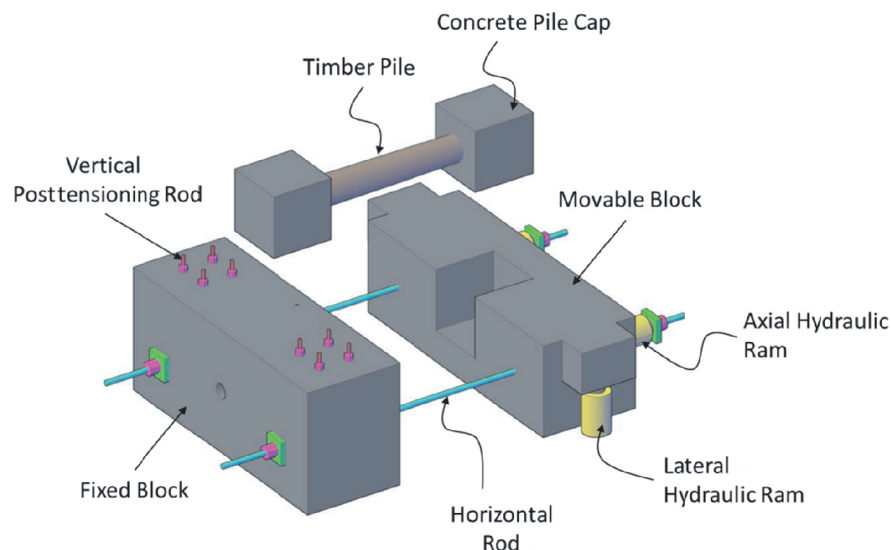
Test setup for testing full-scale timber pile specimens.
